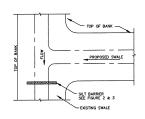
SILT BARRIER AT CONNECTION OF SWALE TO EXISTING SWALE
